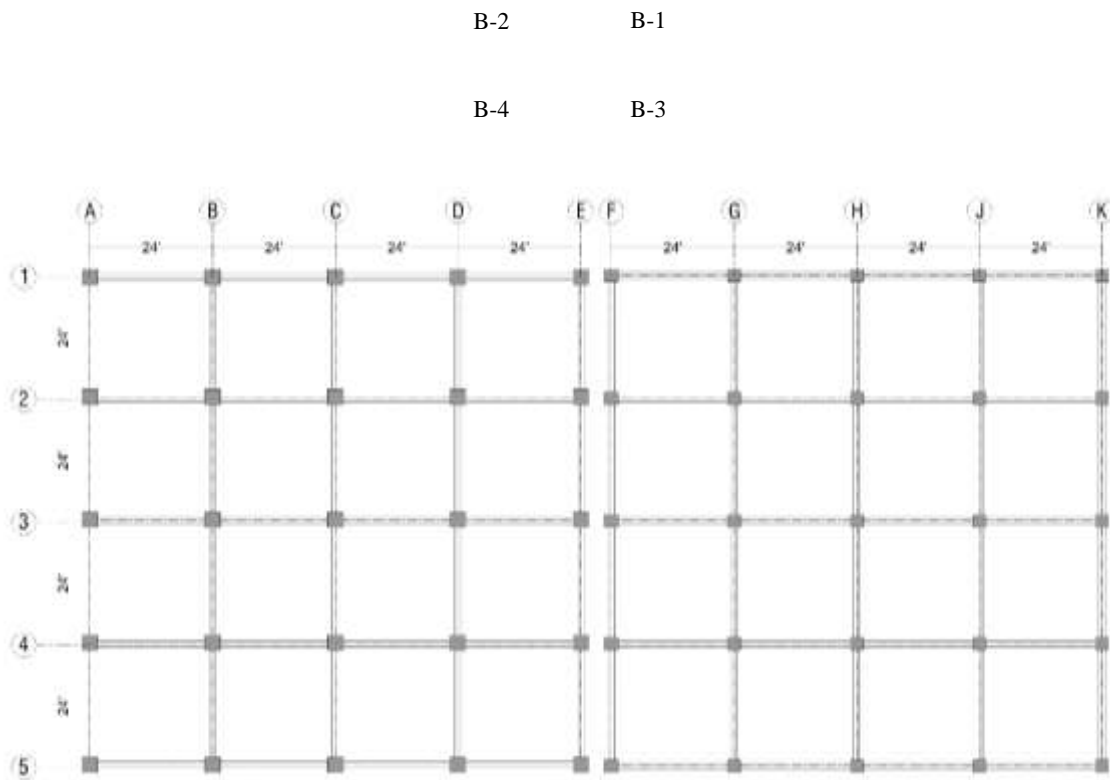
Plan view of taller building (left side) & shorter building (right side)
